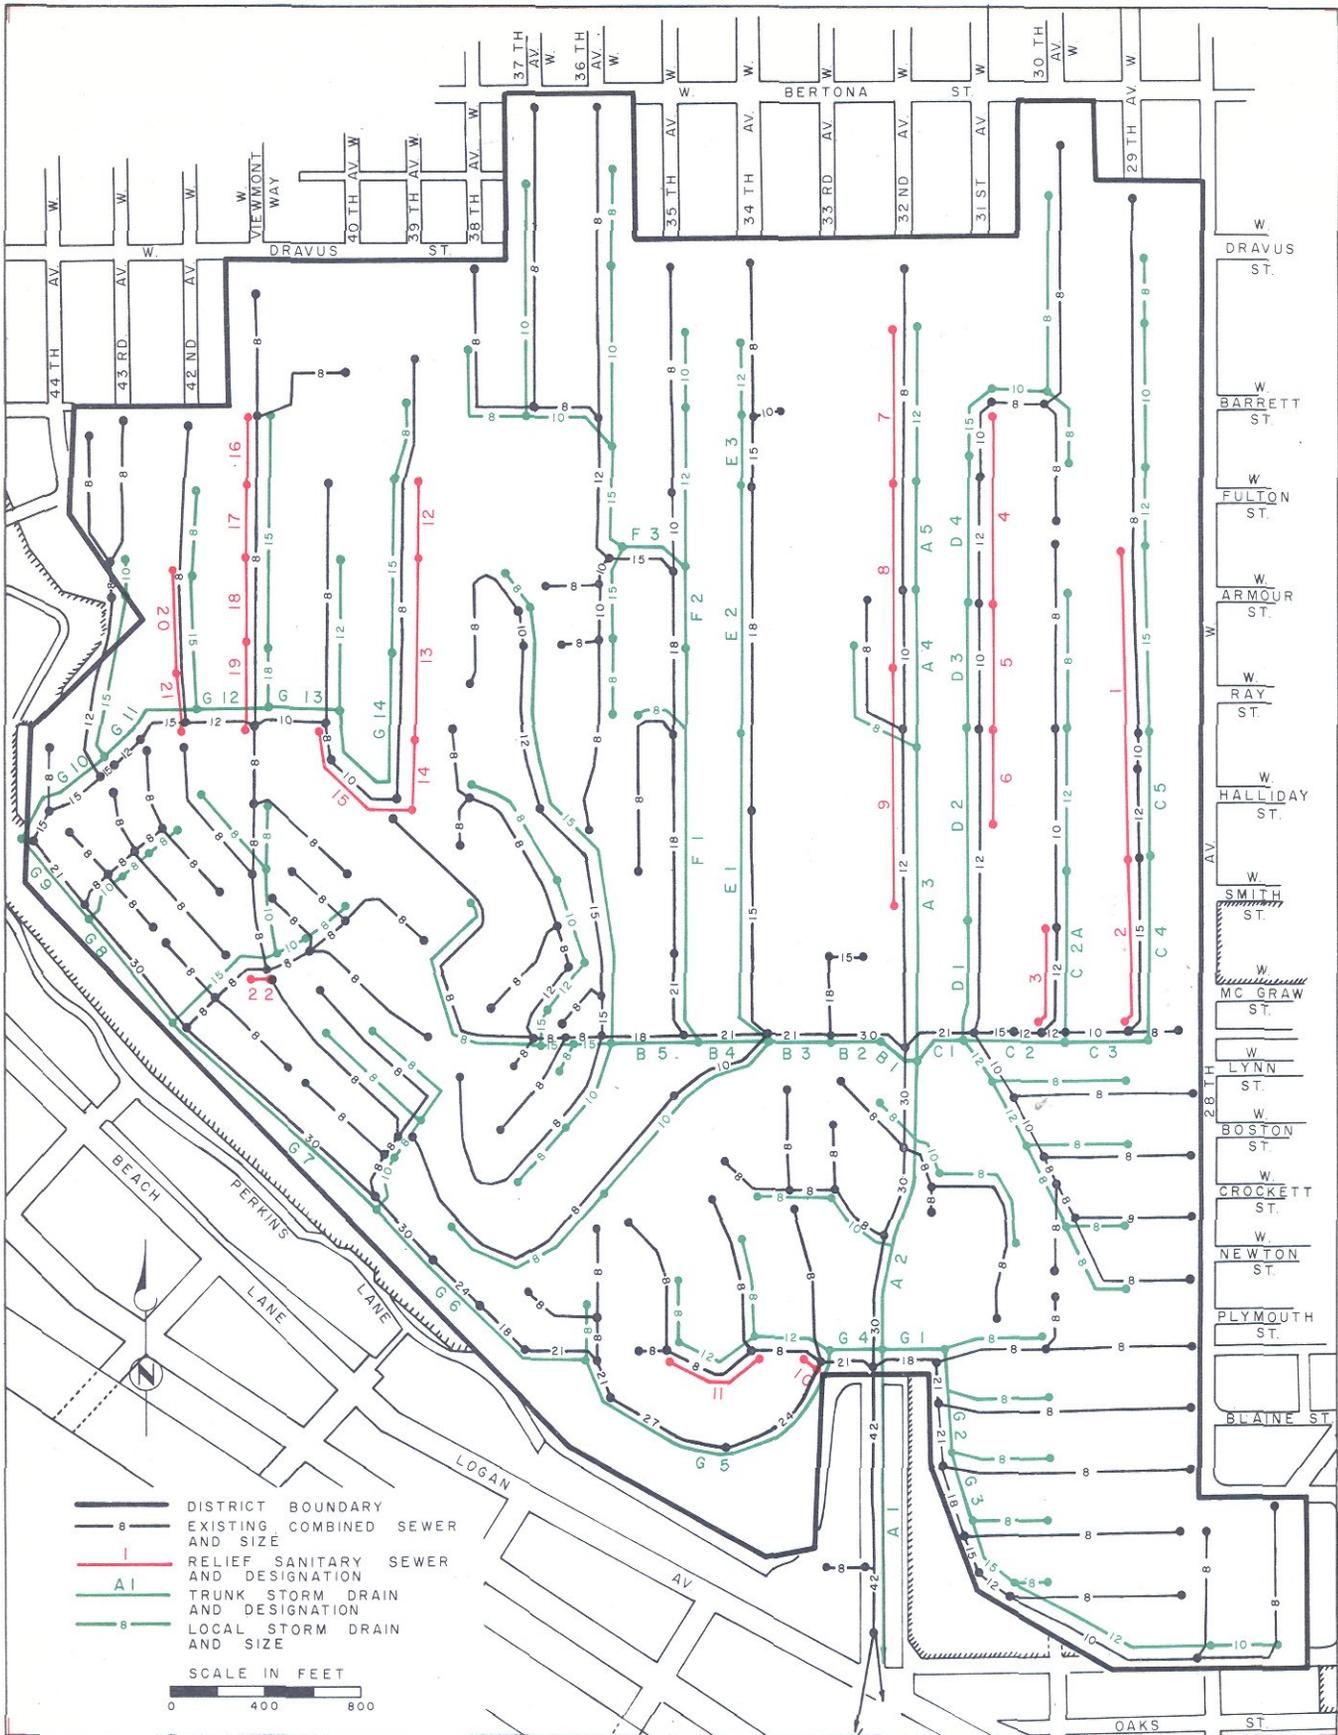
Layout of Facilities for Plan I, Partial Separation, District 29 - South Magnolia
